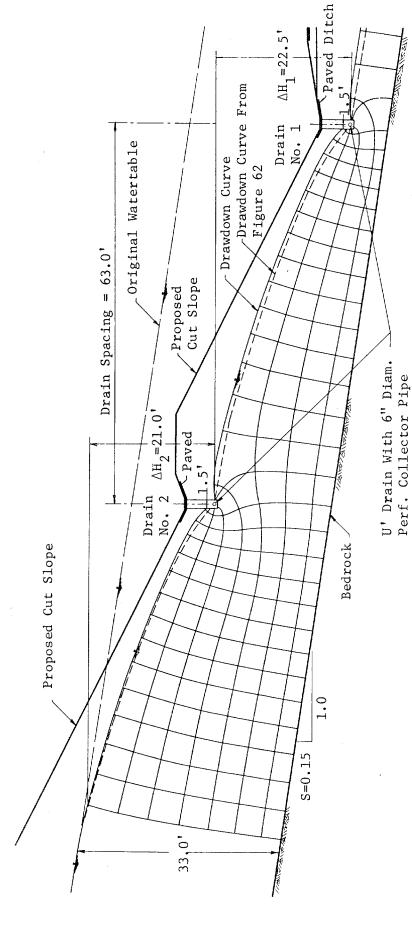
Example No. 22 - Flow Net, Dimensions and Details
